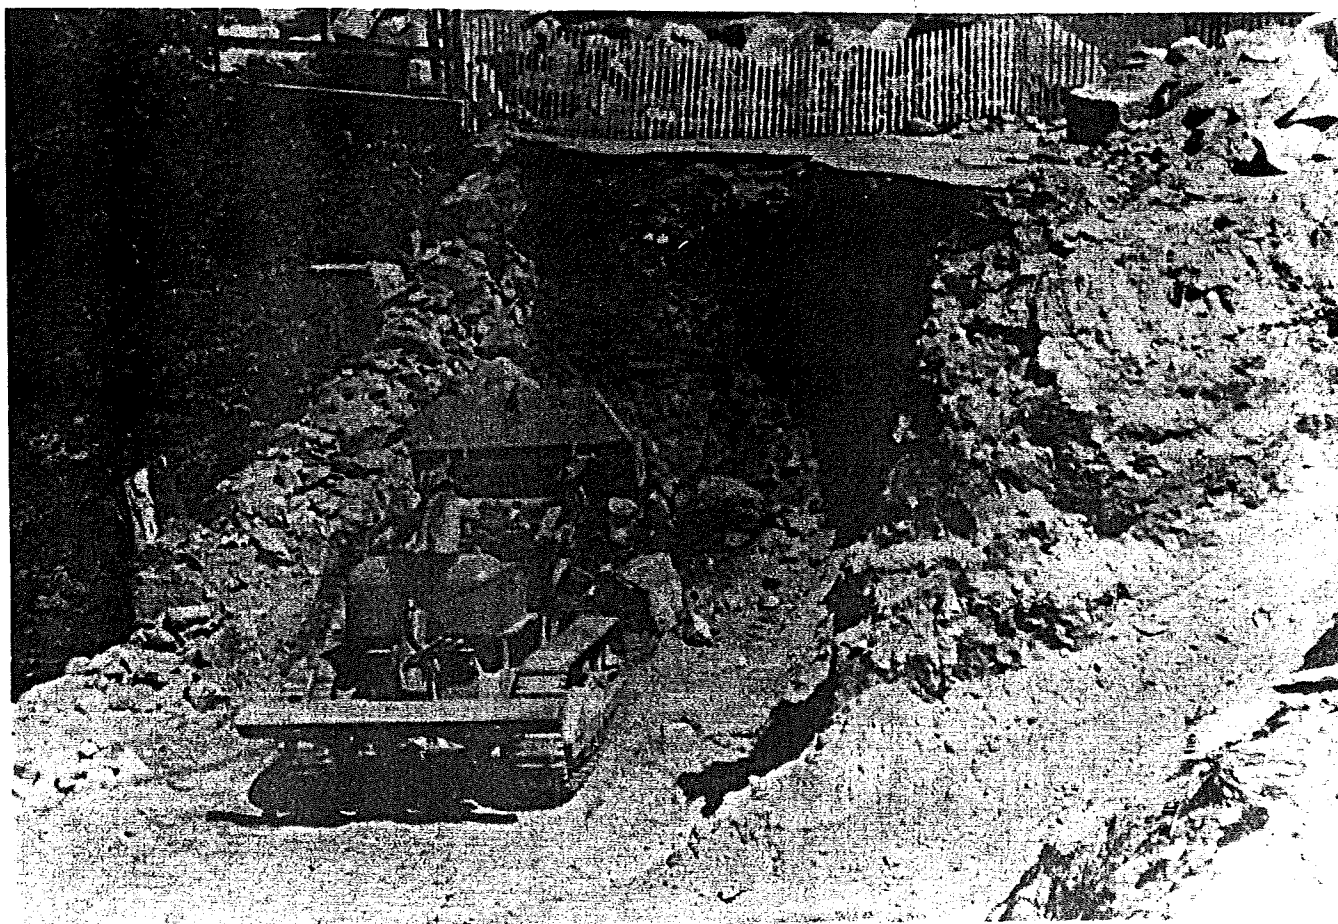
Detail of Green Street Bridge repairs with Ken Richards excavating northeast wing wall and backfill. Photo, July 1961. Courtesy of Armand Michaud, Ipswich DPW.
